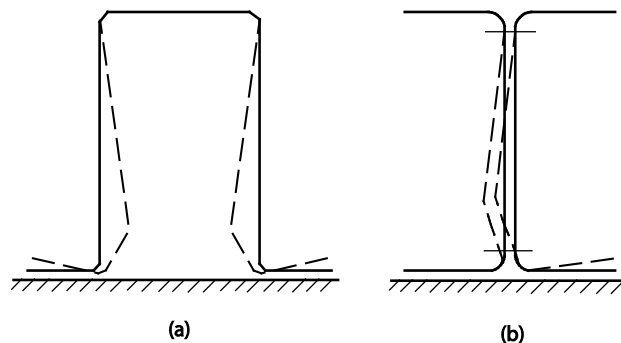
Web Crippling of Cold-Formed Steel Sections
